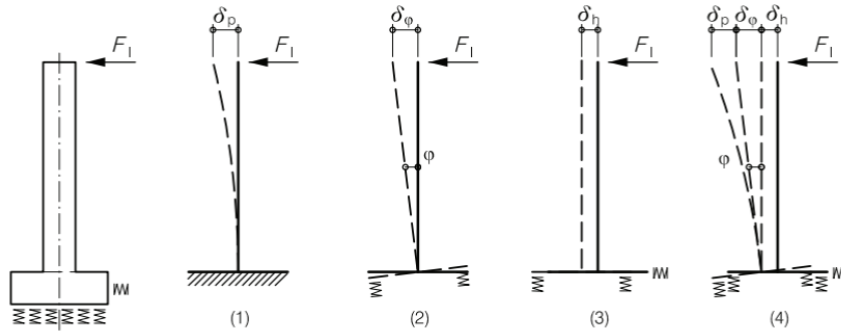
The different deformations of the bridge pier used in railway bridges, (European Committee for Standardization, 2011)
